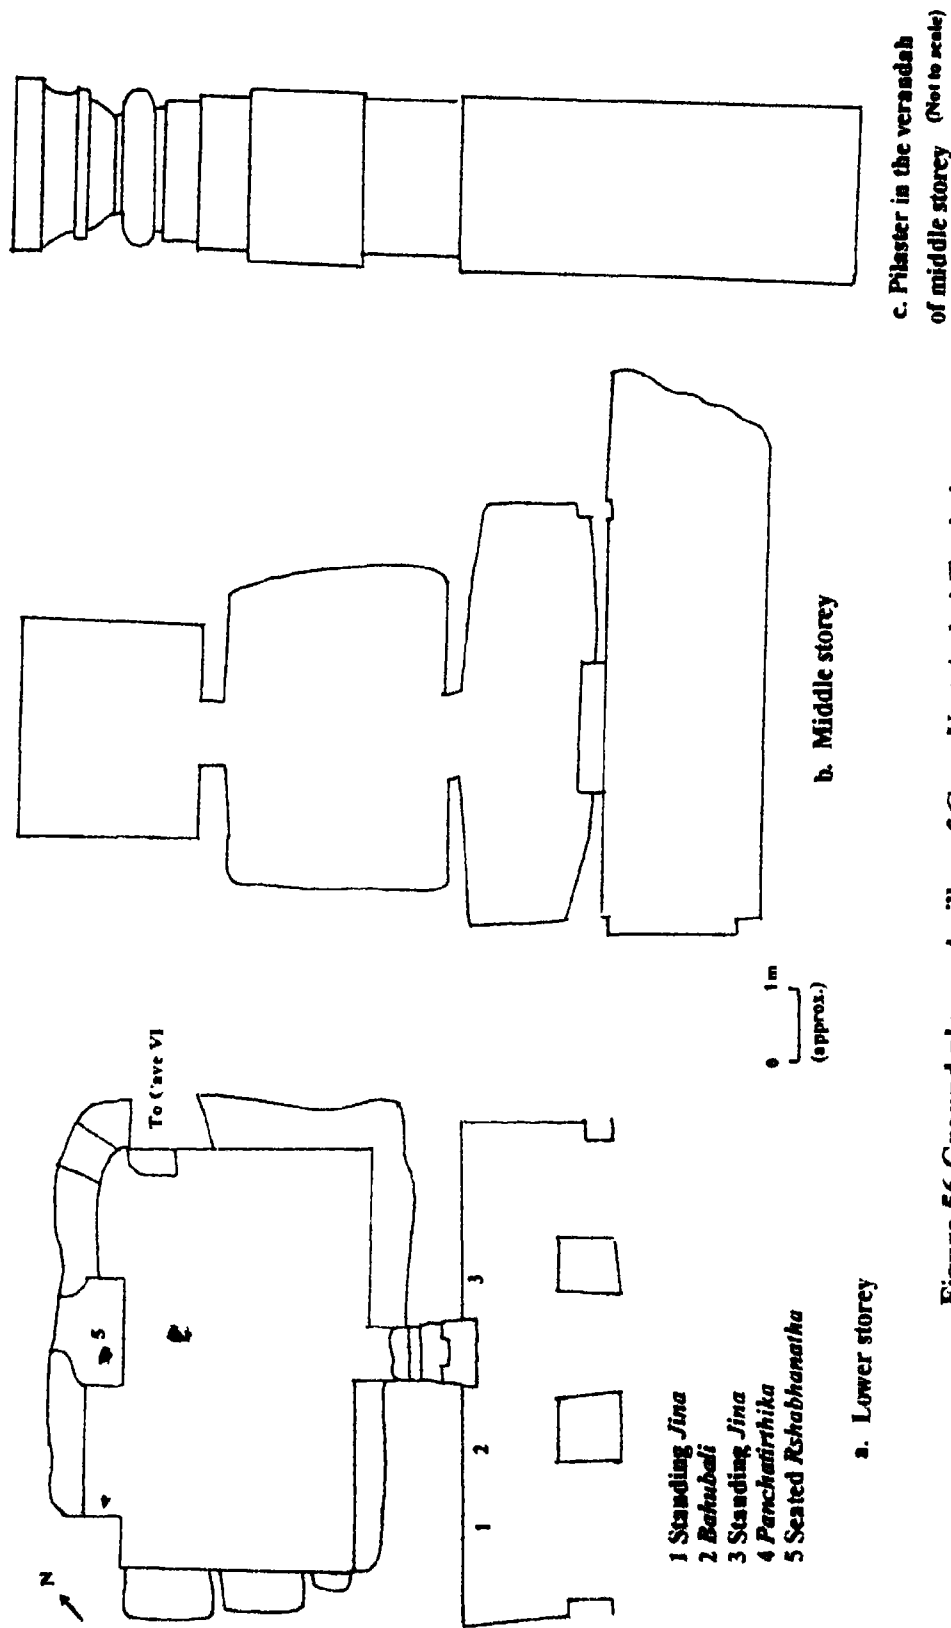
Ground plan and pillar of Cave V at Ankai-Tankai
